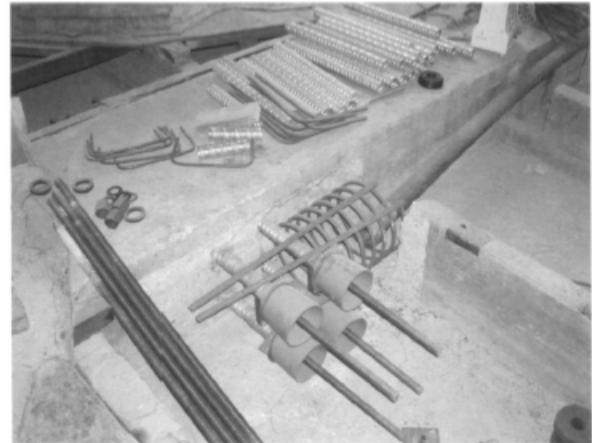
Cracks in the beams of the cantilevered part of the house over the waterfall and installation of cables to maintain the beams in traction following the prestressing technique.
